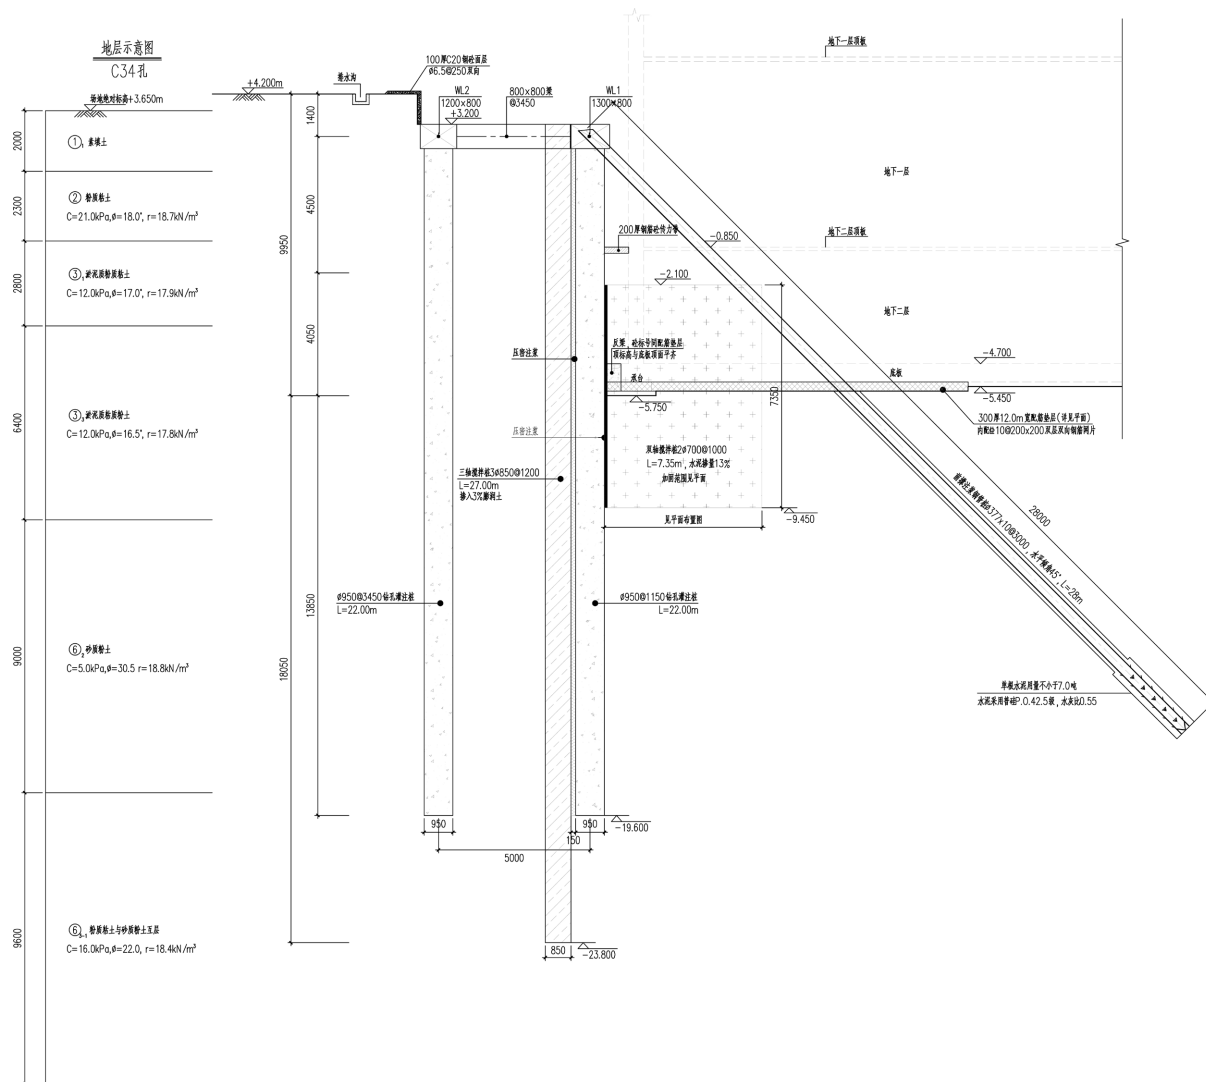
Sectional view of retaining wall in the middle of foundation pit
